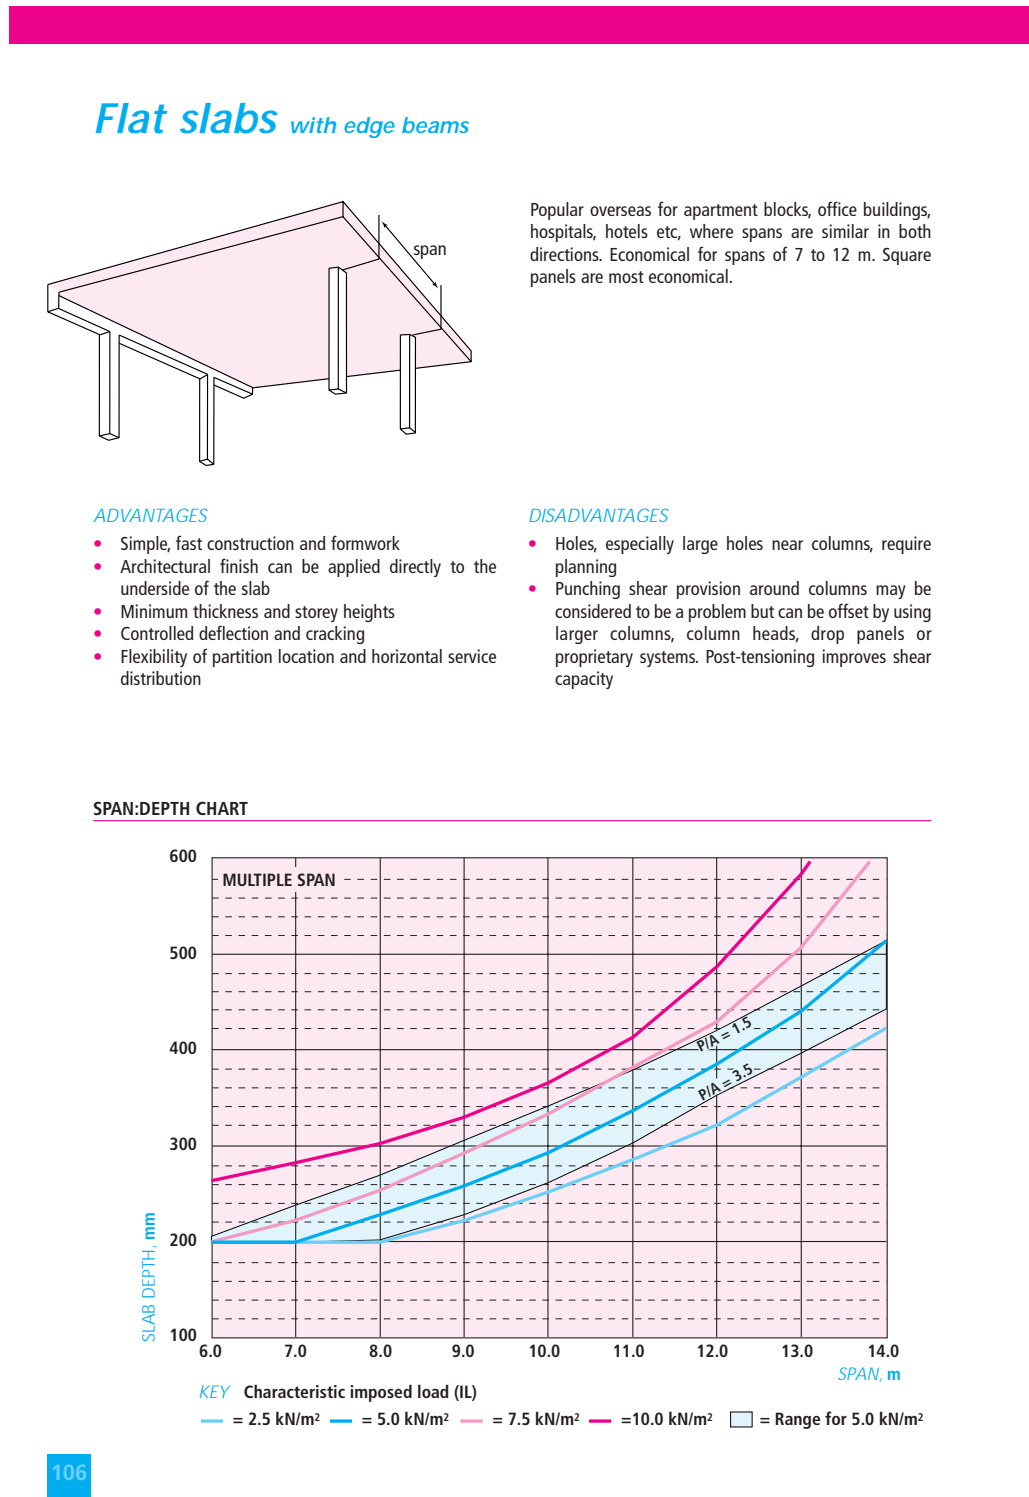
Design information for reinforced concrete structure with flat slab floors - Page 1 (Goodchild, 1997)
